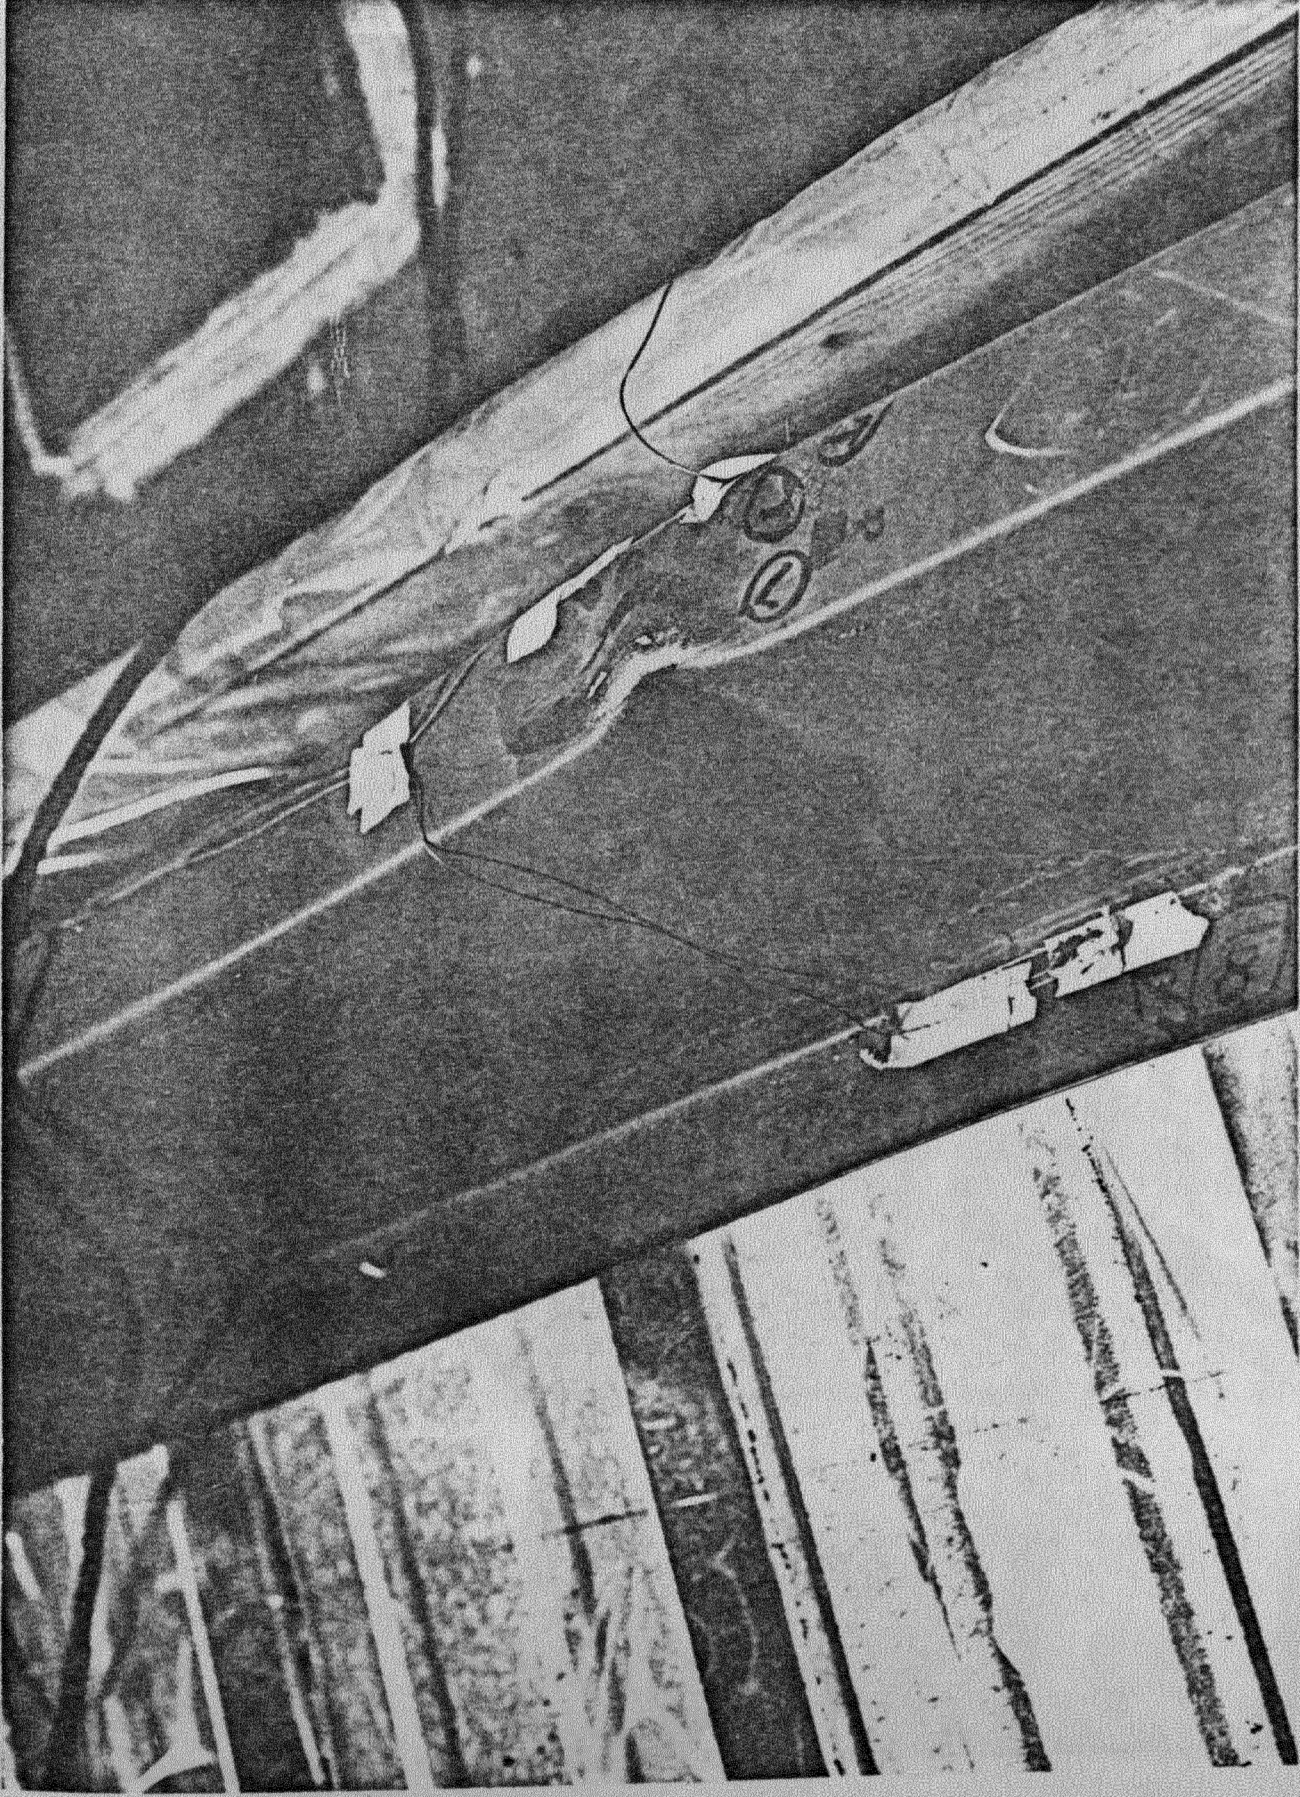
View of Local Buckle in the Second Z-Section Purlin Assembly
